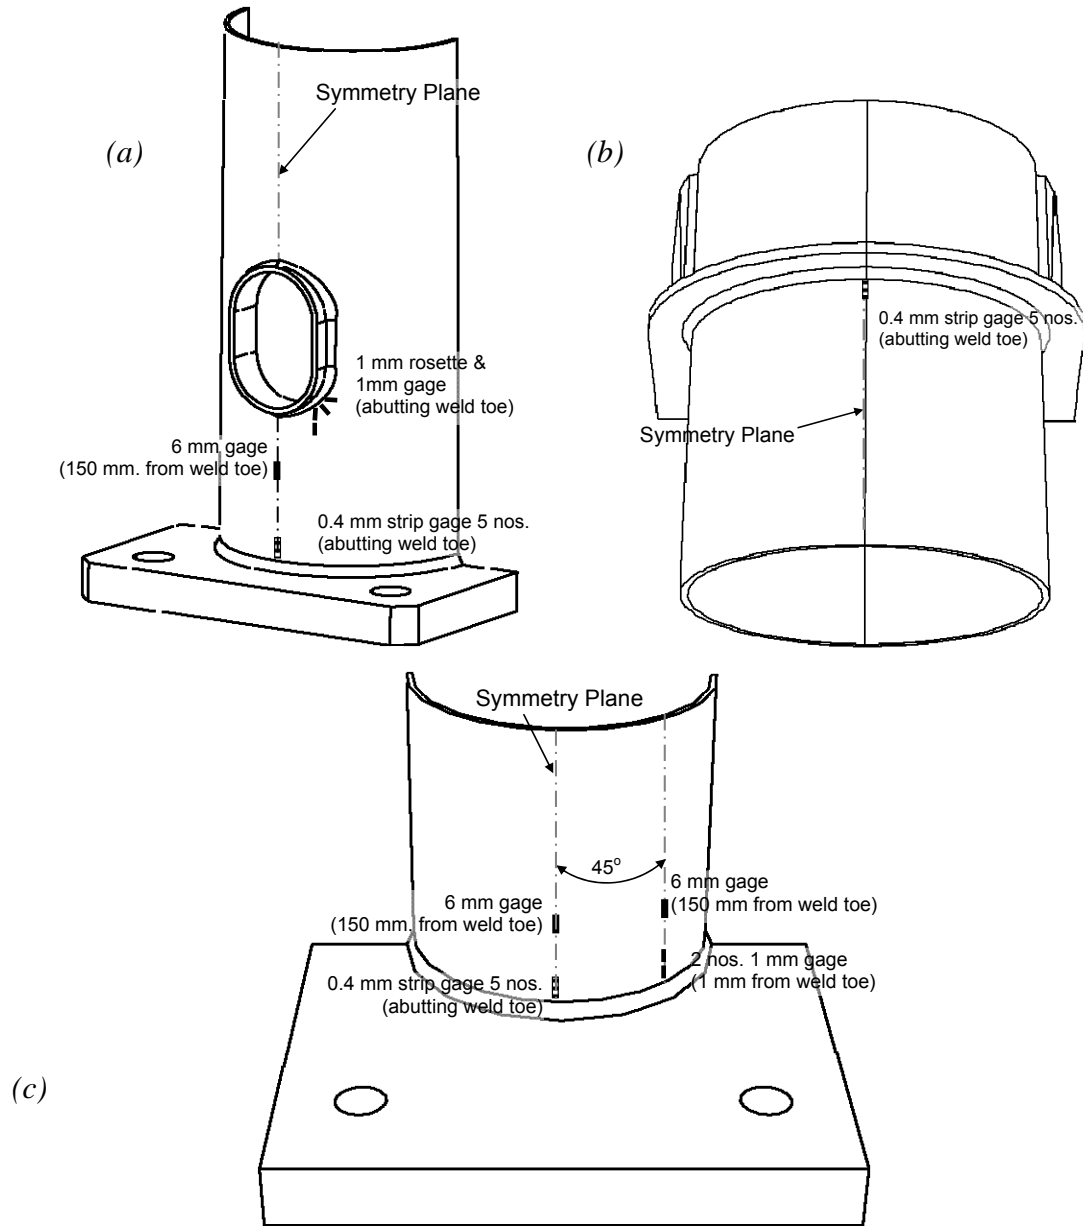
Strain gauge layout in specimen Type I: (a) pole base and hand hole; (b) side gusset top; (c) arm base
